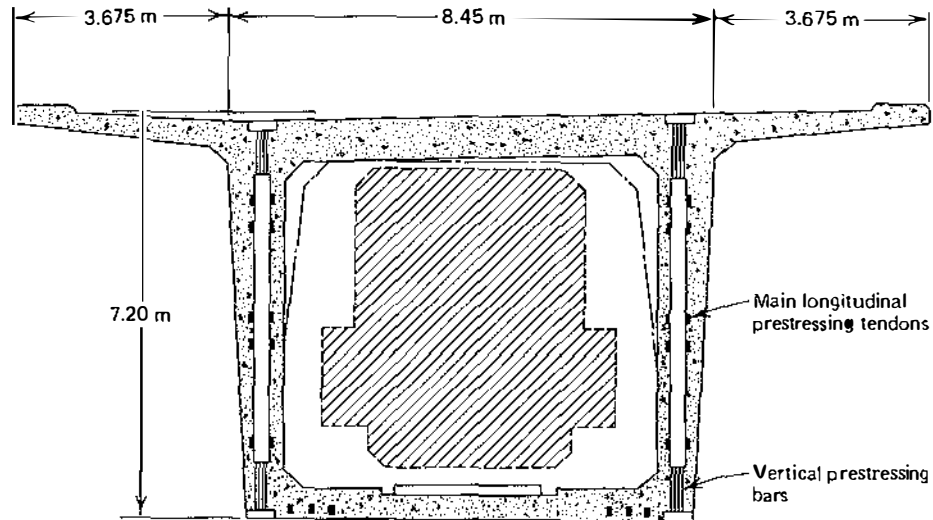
Danish Great Belt Bridge, section through deck beam at expansion and construction joint, from reference 21.
